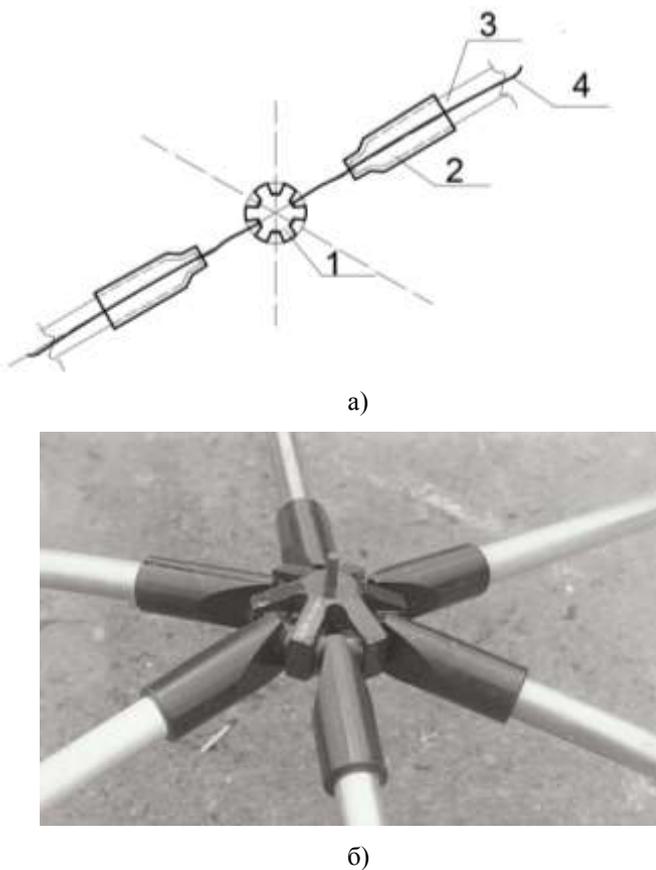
Hinge knot with internal tension. a) top view; b) photo of the unit: 1 - cast hinge element, 2 - rod tip, 3 - rod, 4 - cable
